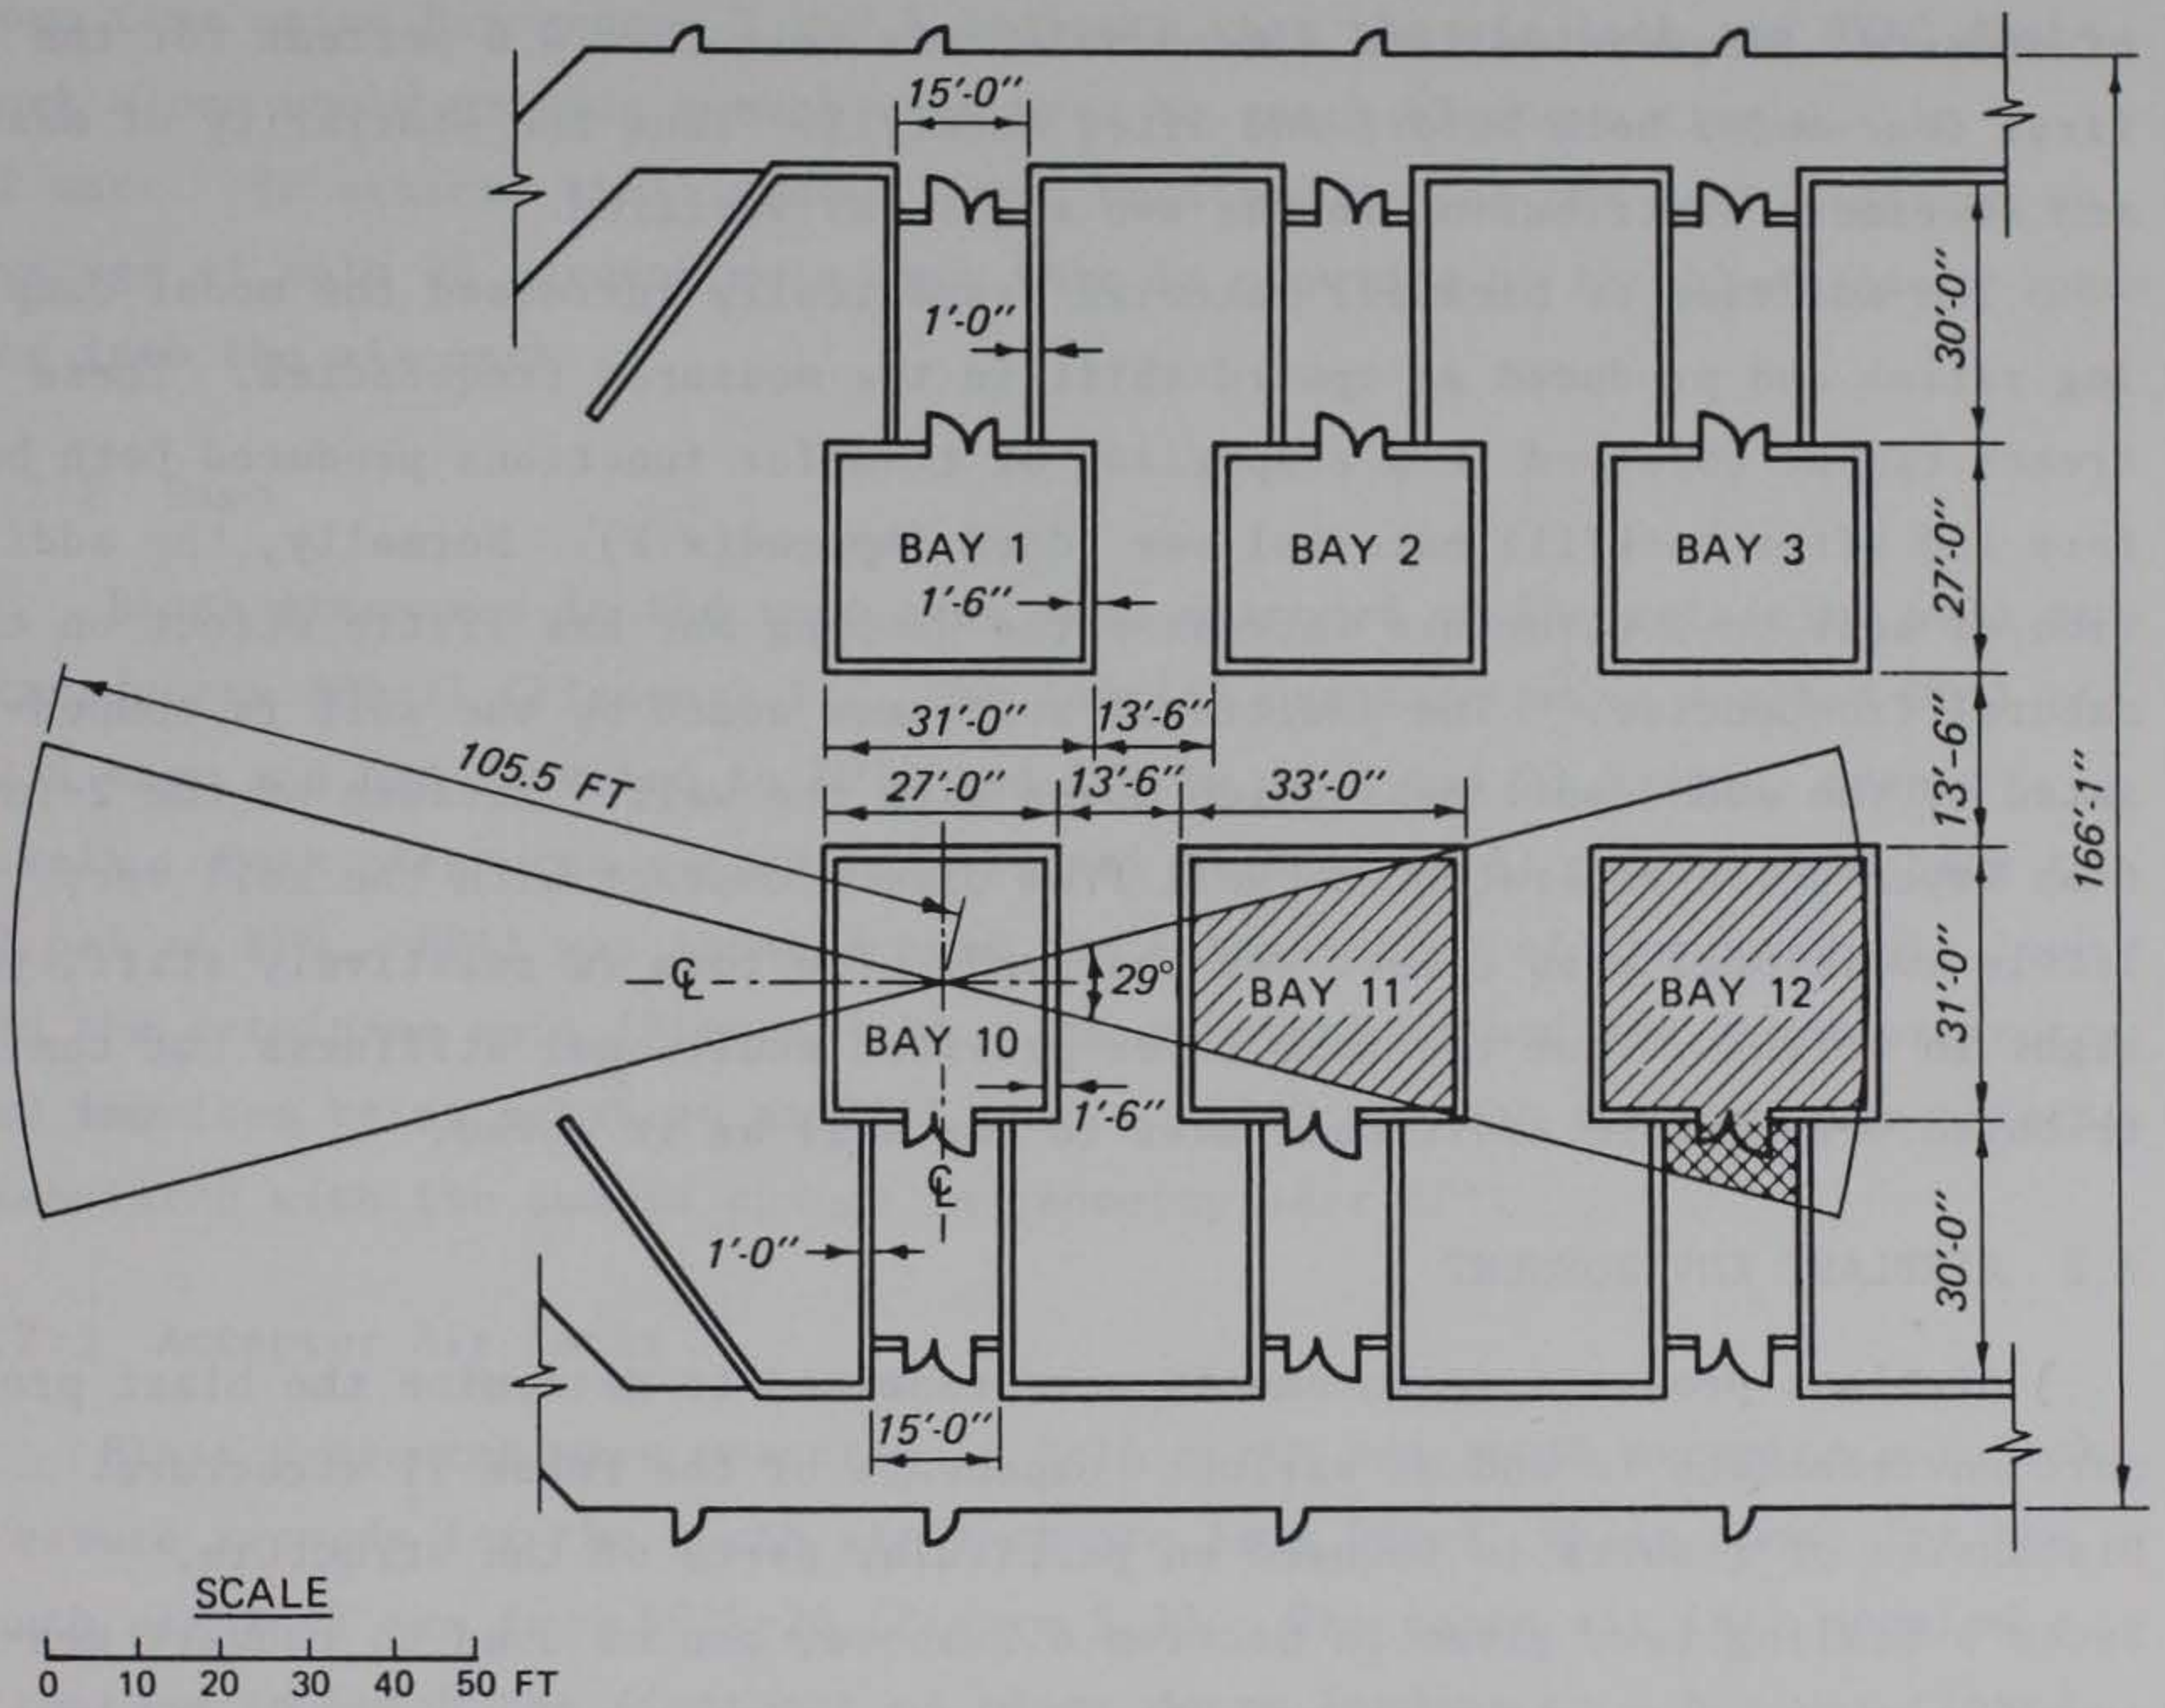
Probable impact zone for roof of bay 10, Building 12-64.
